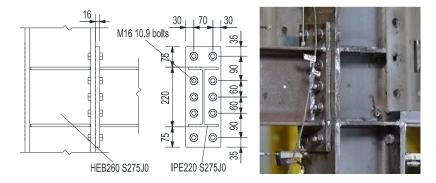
Details of the original EP specimen (dimensions in mm)
